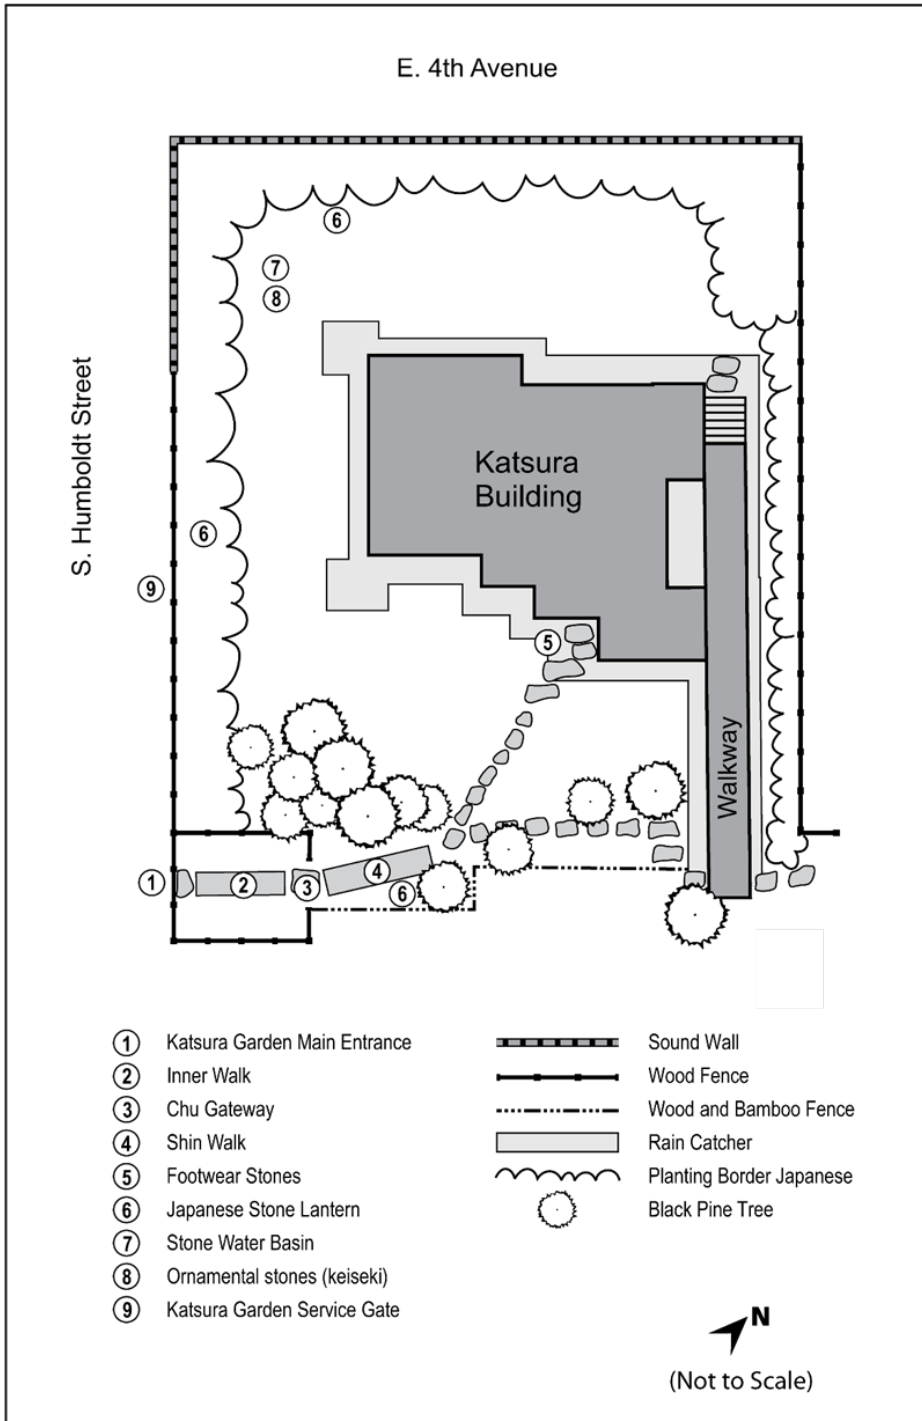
Katsura Building Floor Plan, 2022, Ward Hill
